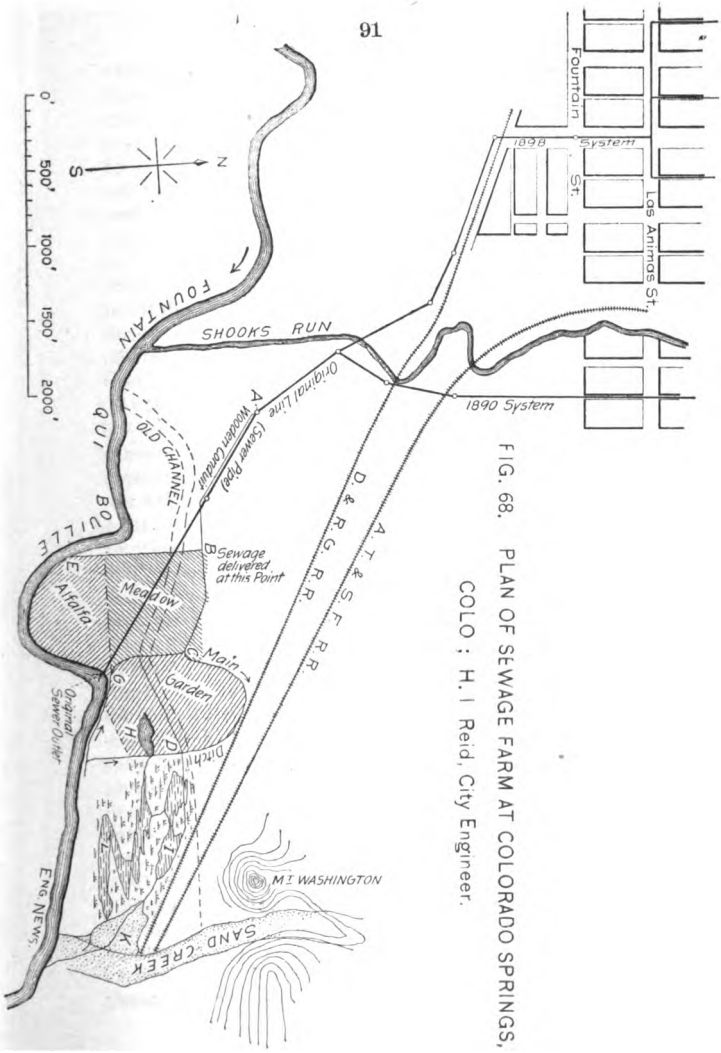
PLAN OF SEWAGE FARM AT COLORADO SPRINGS,
